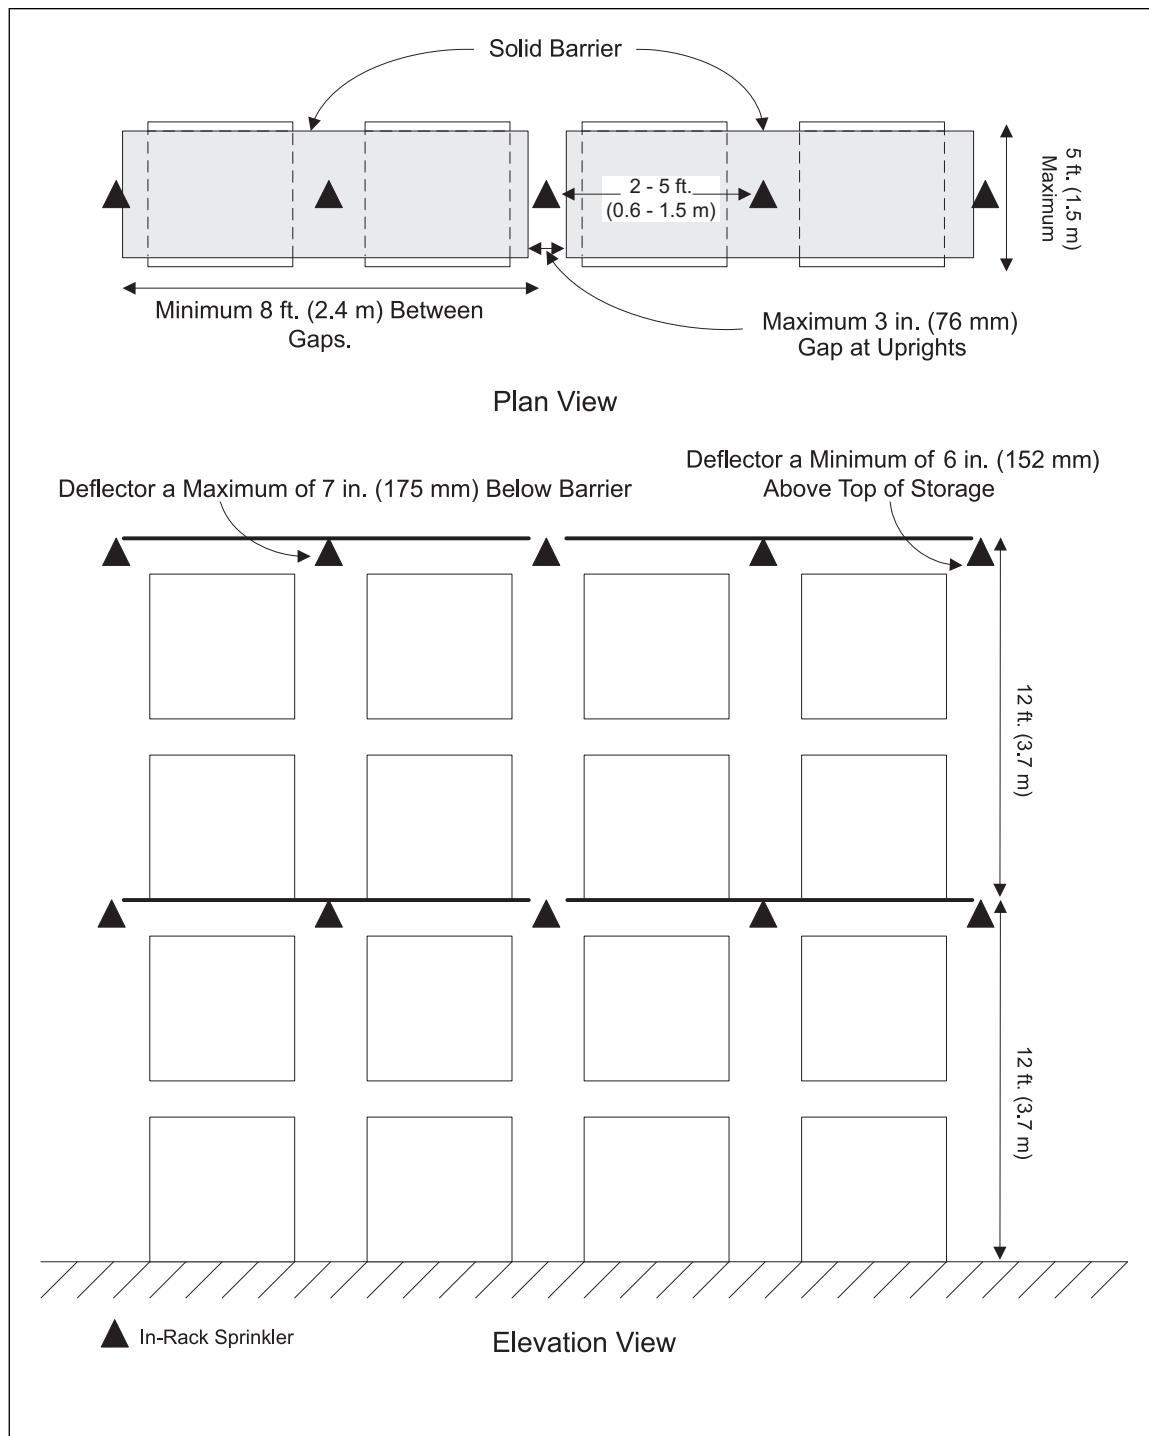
Single-row rack sprinkler layout: fire protection scheme A
